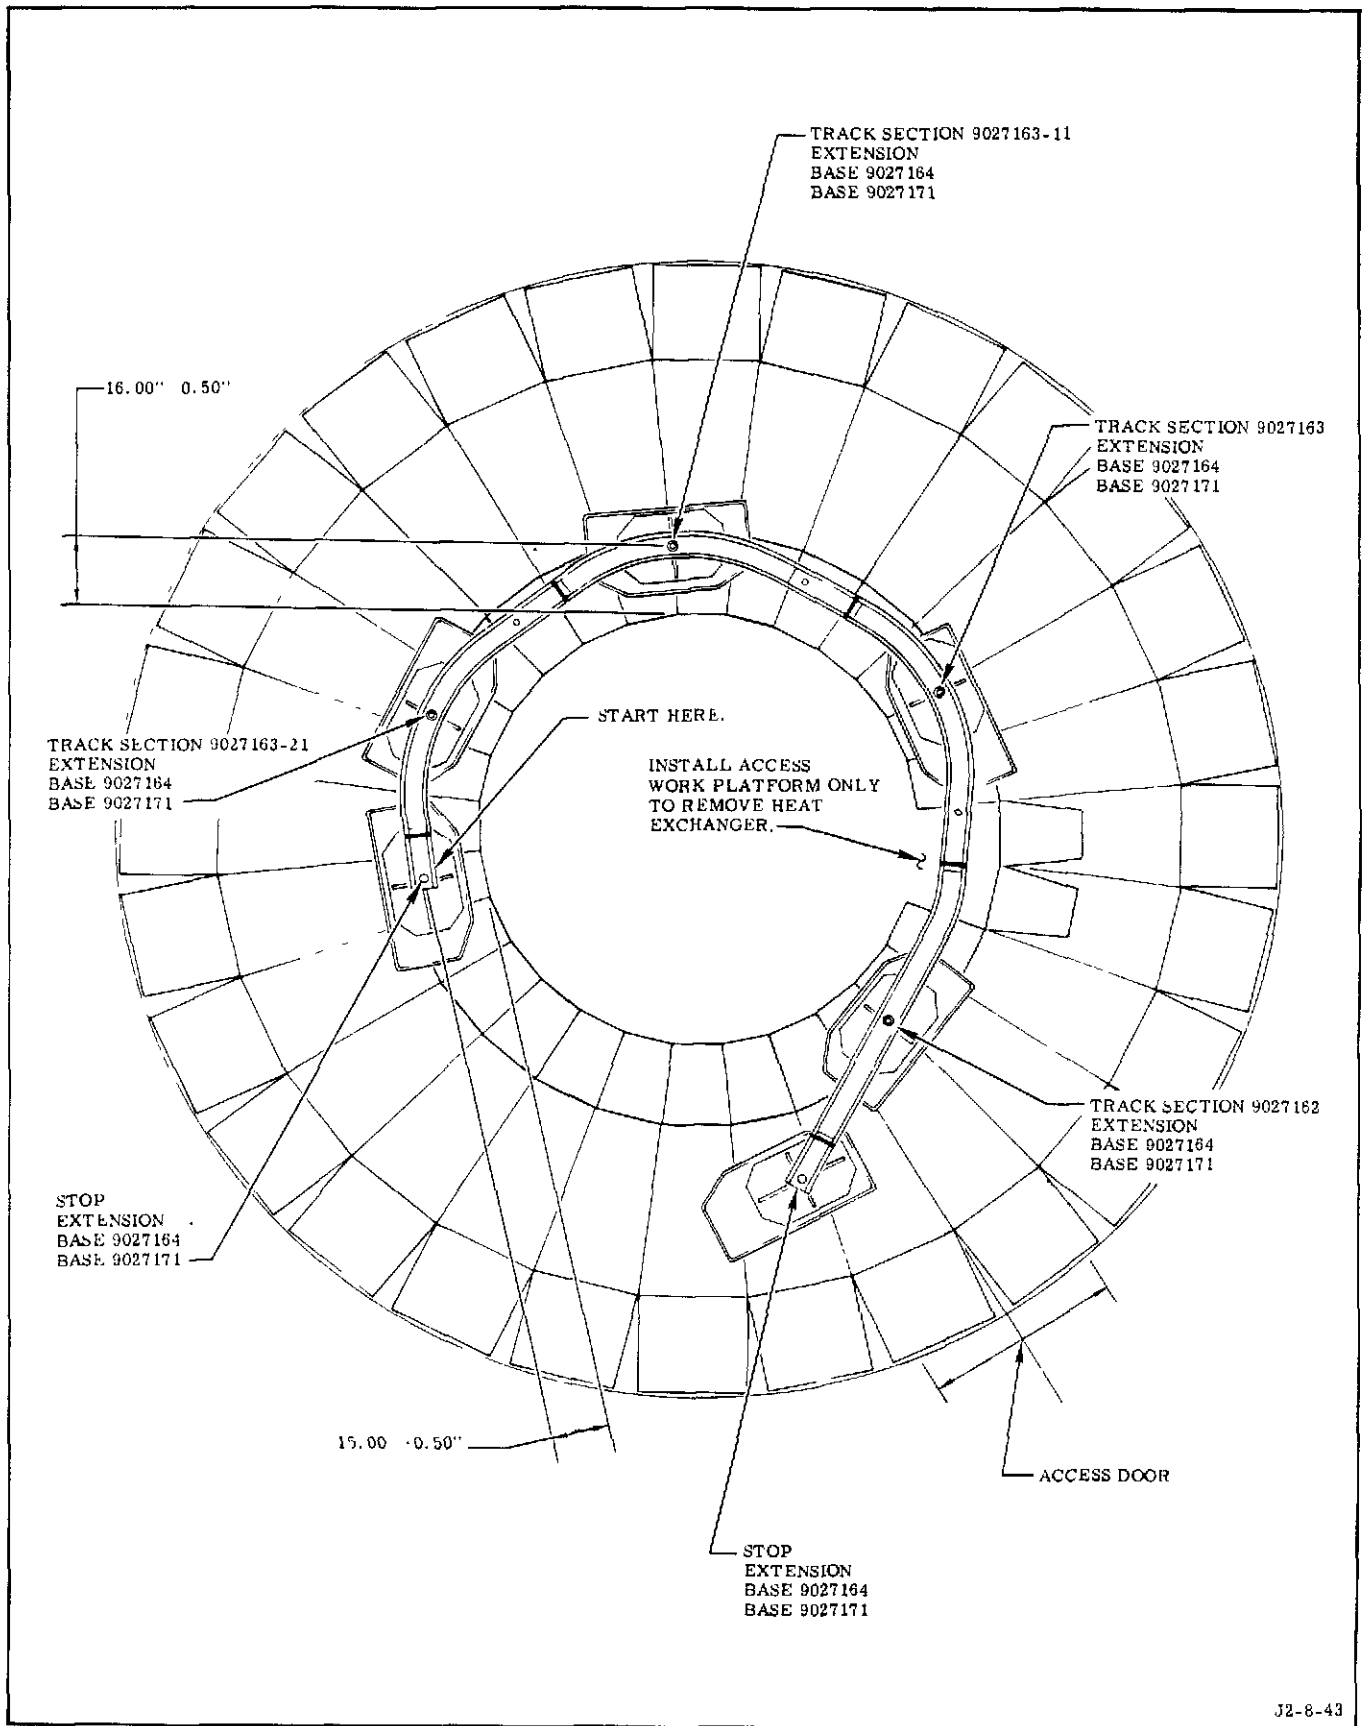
Location of Track Components for Removing Fuel Inlet Duct, Gimbal, Heat Exchanger, and Oxidizer Inlet Duct (200-Series Stage)
